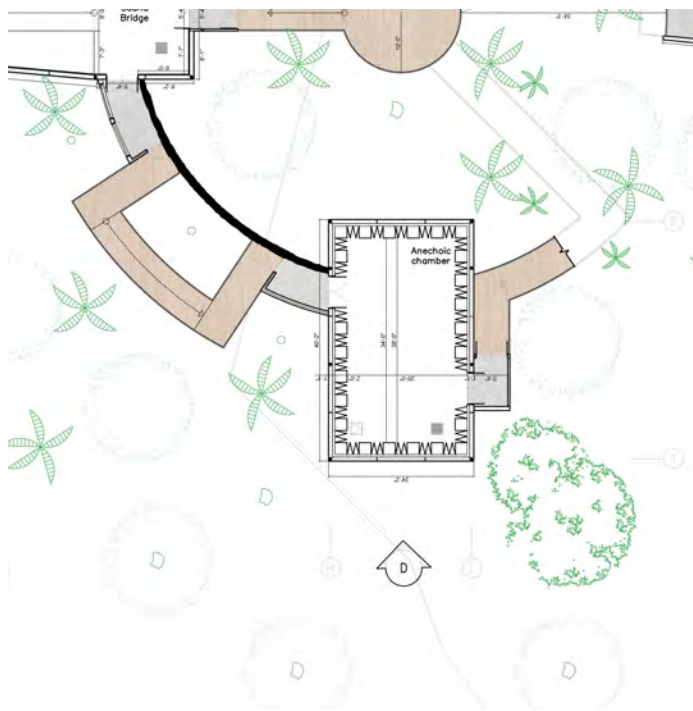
Proposed Ground Floor Plan Anechoic Chamber. Diagram by student Reinaldo E. Hernandez Arcena.
